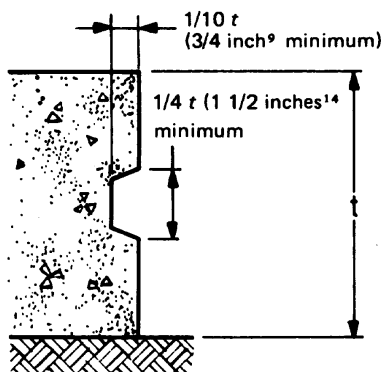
b This tongue-and-groove joint is formed by wood bulkheads. For slabs 5 to 8 inches (125 to 200mm) thick, bevelled 1- by 2 inch (25 by 50mm) strips can be used to form key. Sawcut permits key to swell slightly without cracking concrete.
